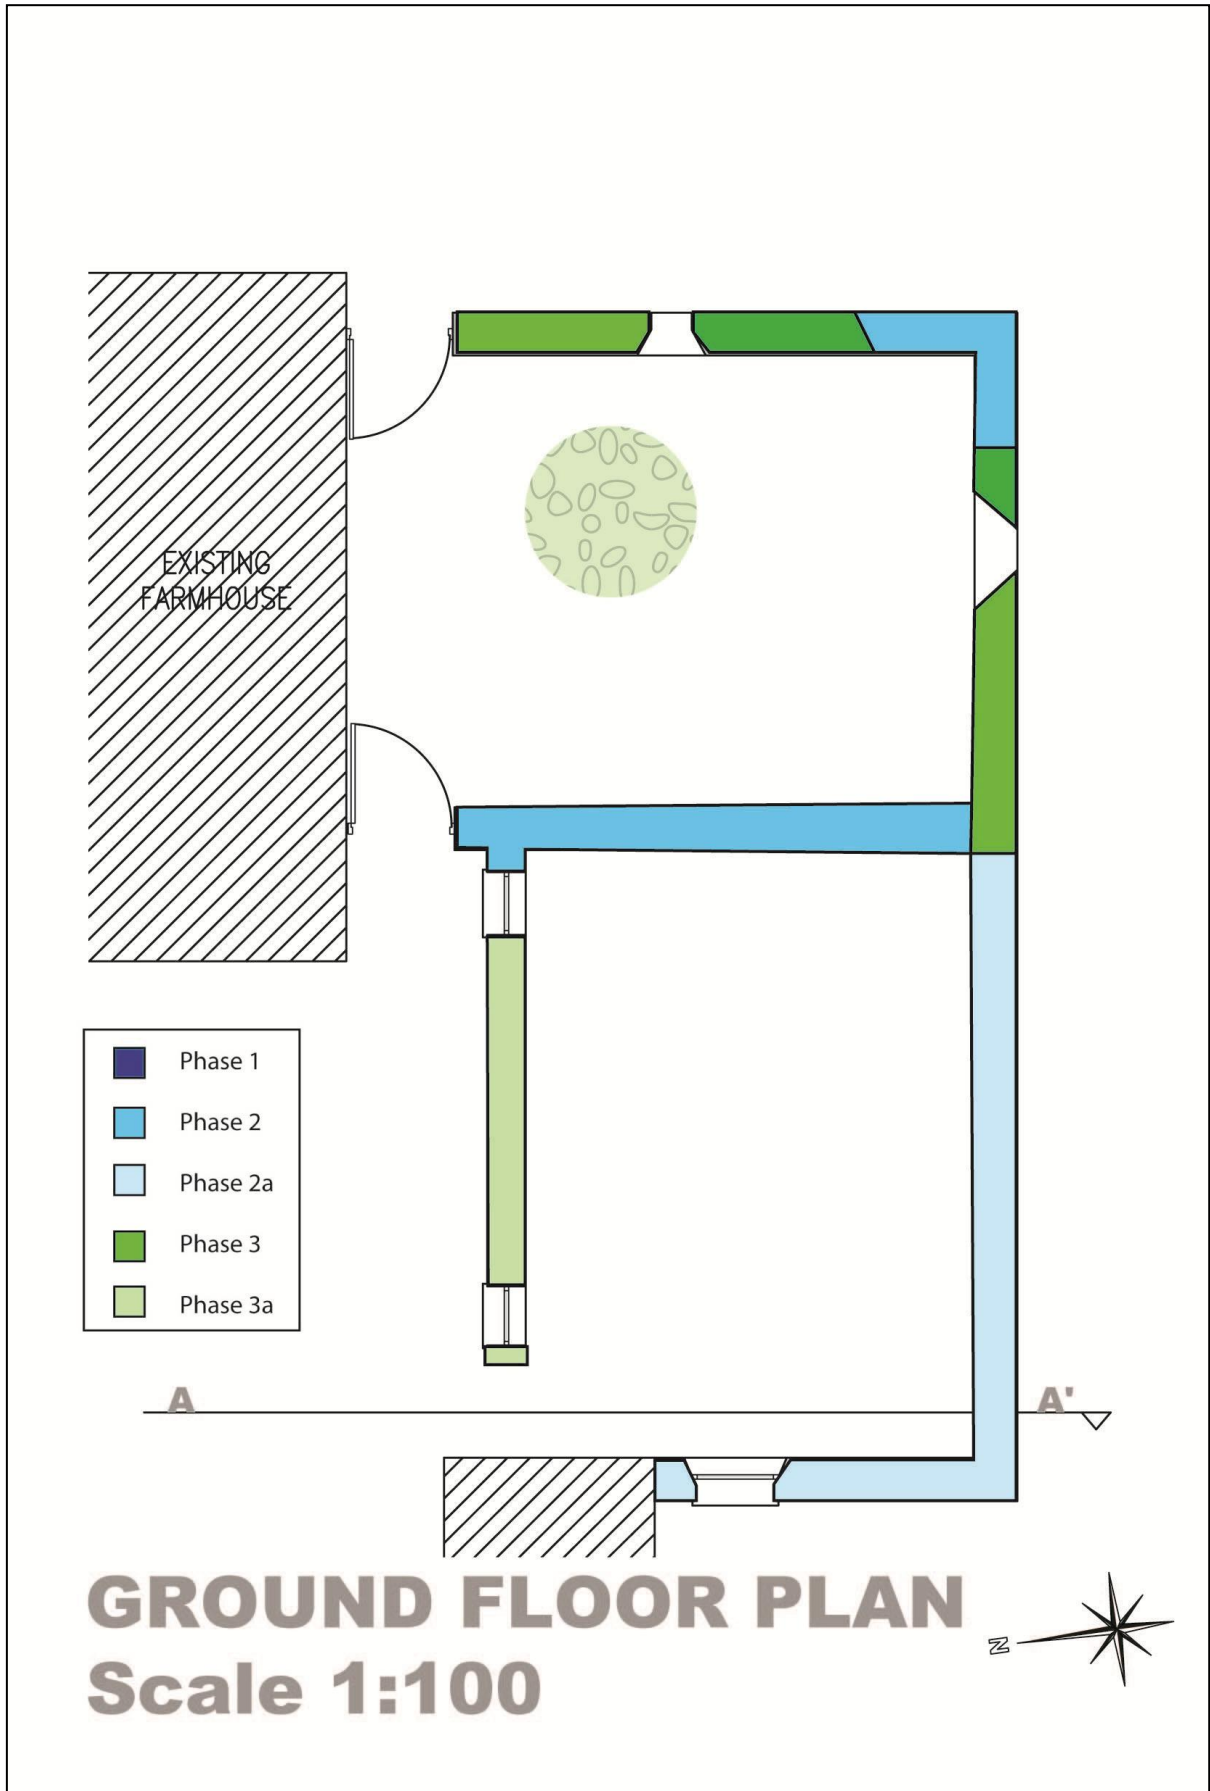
PHASING OF THE BARN; FLOOR PLAN.
